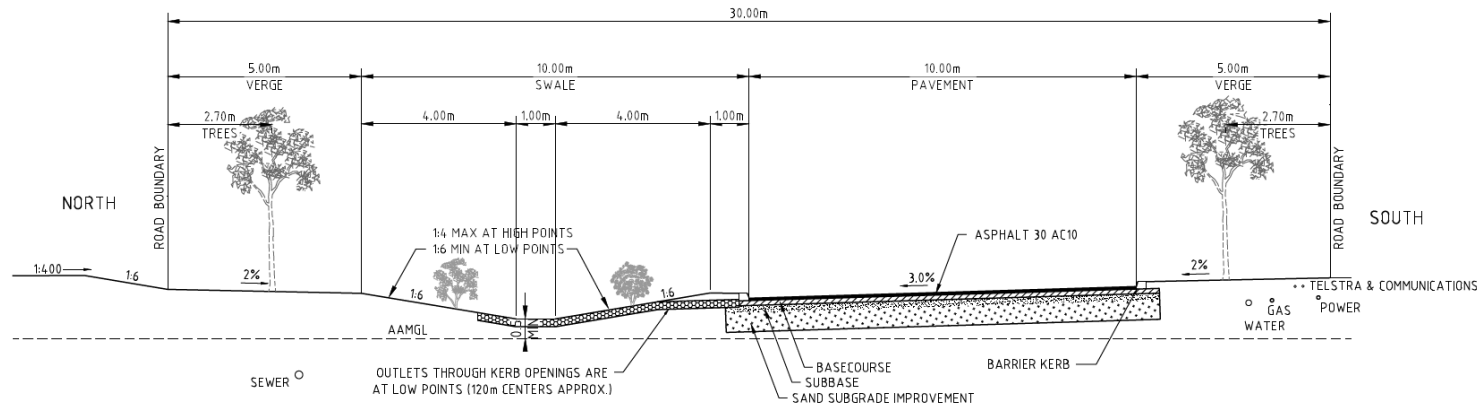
Proposed Other Roads Cross-Section – 30m wide Road Reserve with Roadside Drain
